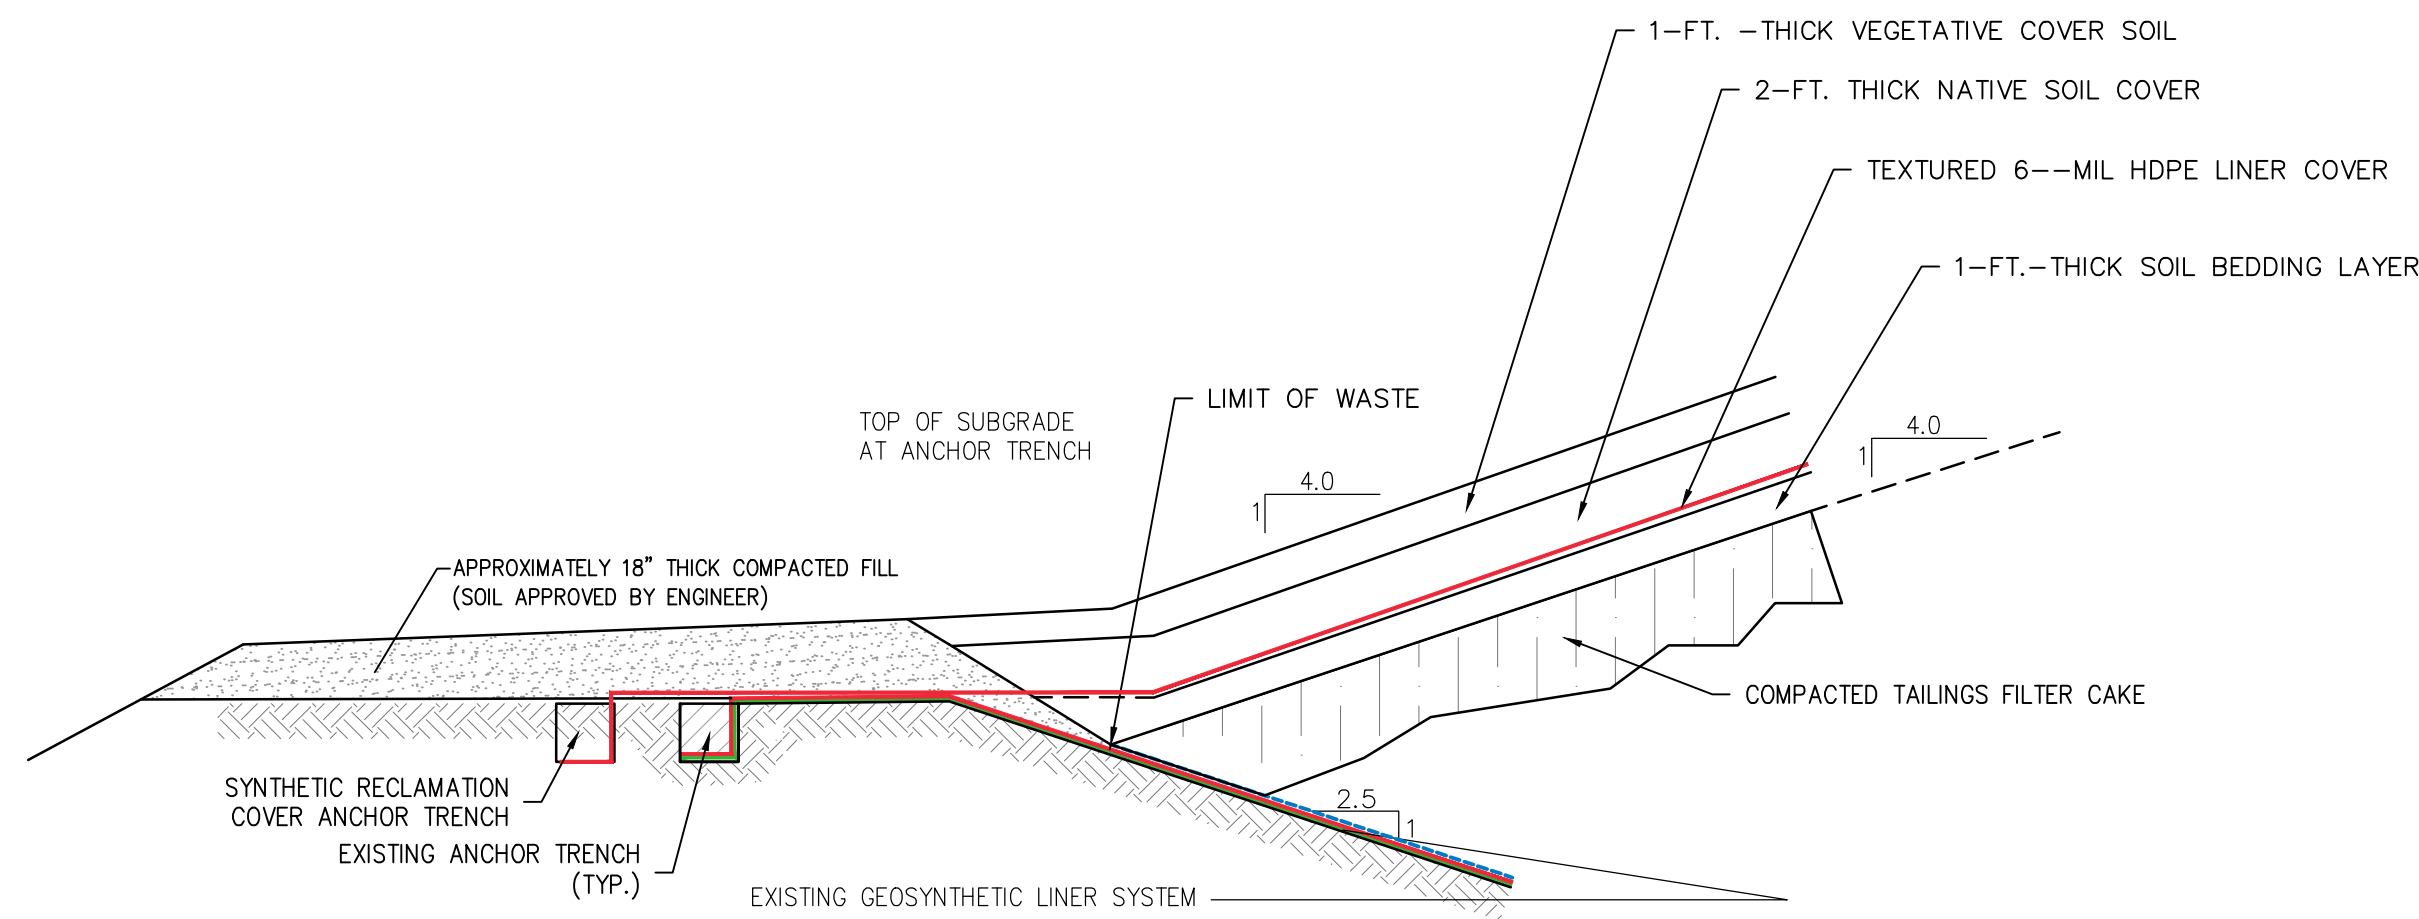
TAILINGS LANDFILL AND LEACHATE COLLECTION POND SECTIONS AND DETAILS LEADVILLE MILL T110 PERMIT AMENDMENT LAKE COUNTY, COLORADO
